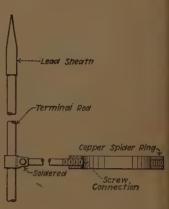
Details of copper spider, showing attachment to terminal rod.
